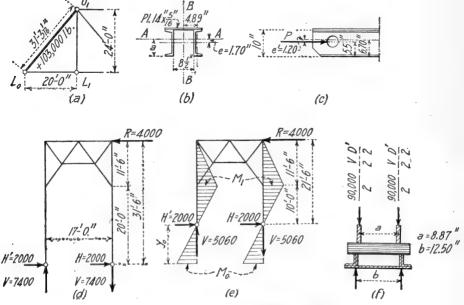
END-POST OF A HIGHWAY BRIDGE.
